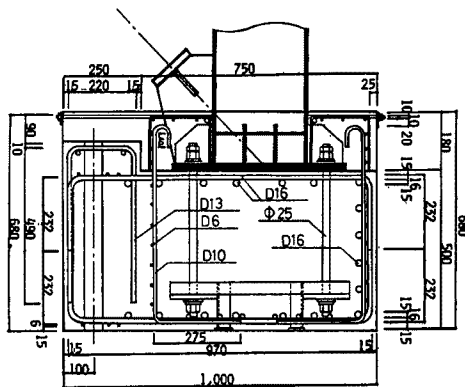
(c). Detail of reinforcement of base concrete (G, H-Type specimen) (Unit: mm).
